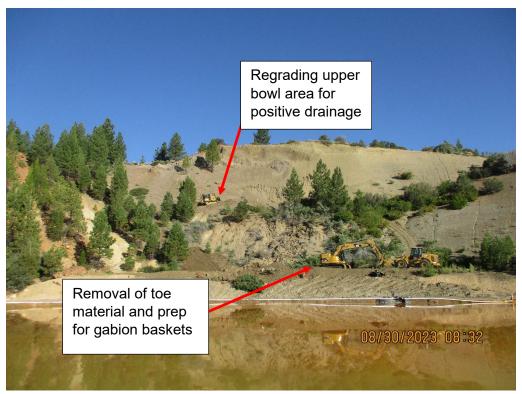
August 30, 2023, Stabilization work being performed on the Pit Slump.
